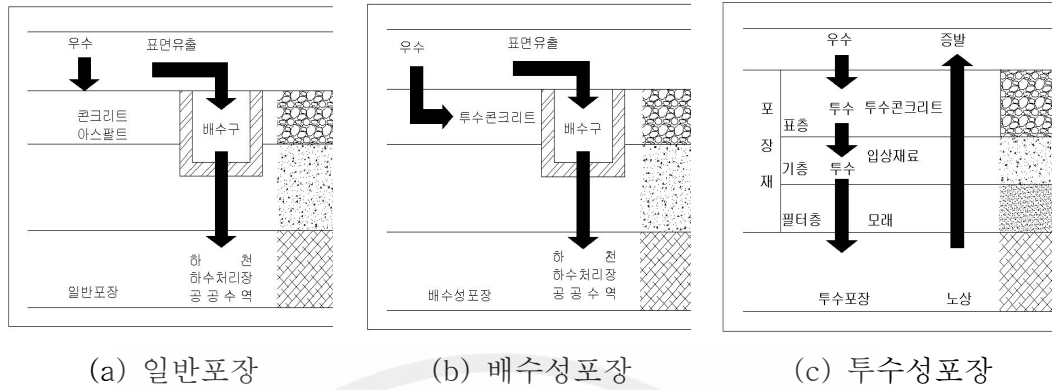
The rainfall flow of porous pavement & drainage pavement
